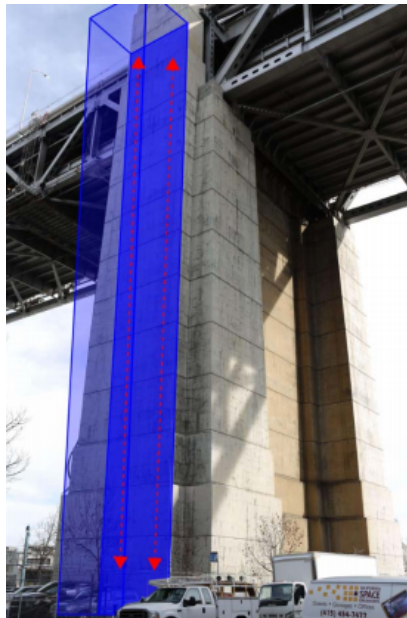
Example of a Bike Elevator for Lift up to Bridge Deck
